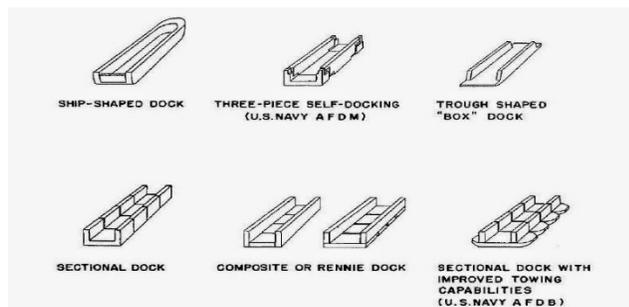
SOME FLOATING DRY DOCKS BASED ON SHAPE AND MODULAR STRUCTURE
